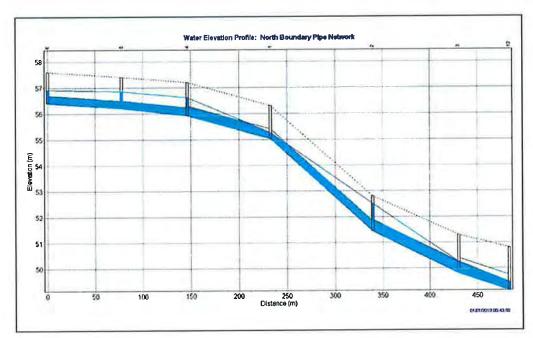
Long Section Plot - Conceptual Network 2 (Pipe under the northern boundary road)
